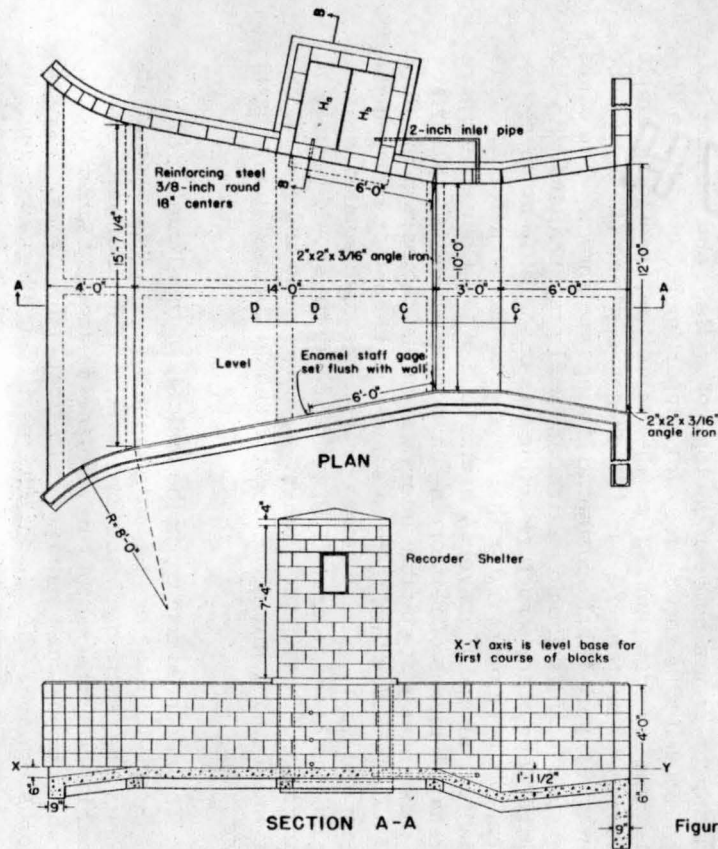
Parshall Measuring Flume of concrete block construction, with 10-foot throat
